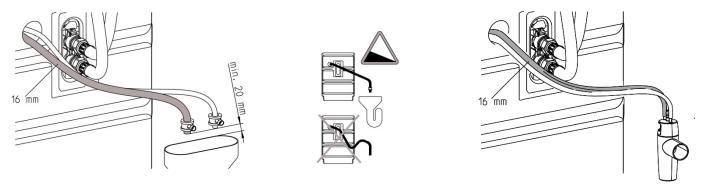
Drain connection of overflow hose of brine tank with and without accessory drain connection DN 50 according to DIN EN 1717 (order no. 188 875)
